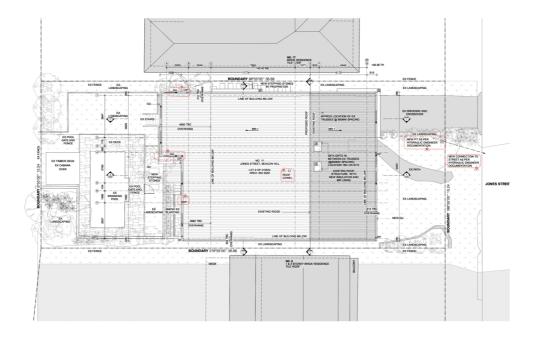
CDC Site Plan 11 Jones Street, Beacon Hill
